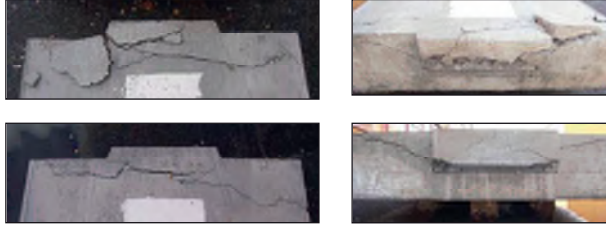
Photos of shear key type 1 with a failure activating the reinforcement.
